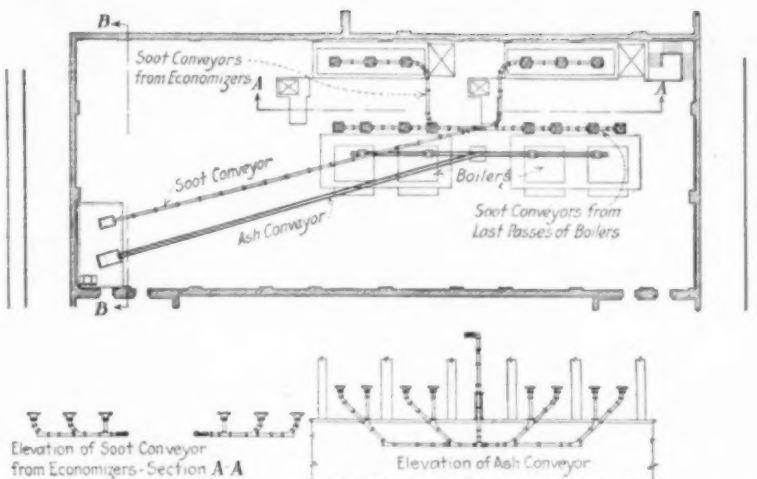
AIR CONVEYOR AT MILWAUKEE SEWAGE-DISPOSAL POWER PLANT. PLAN
